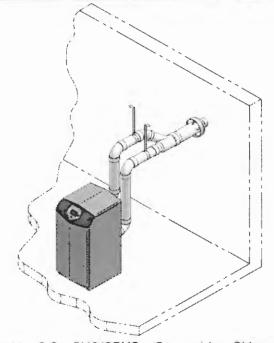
PVC/CPVC Concentric Sidewall Termination - See page 25 for more details
